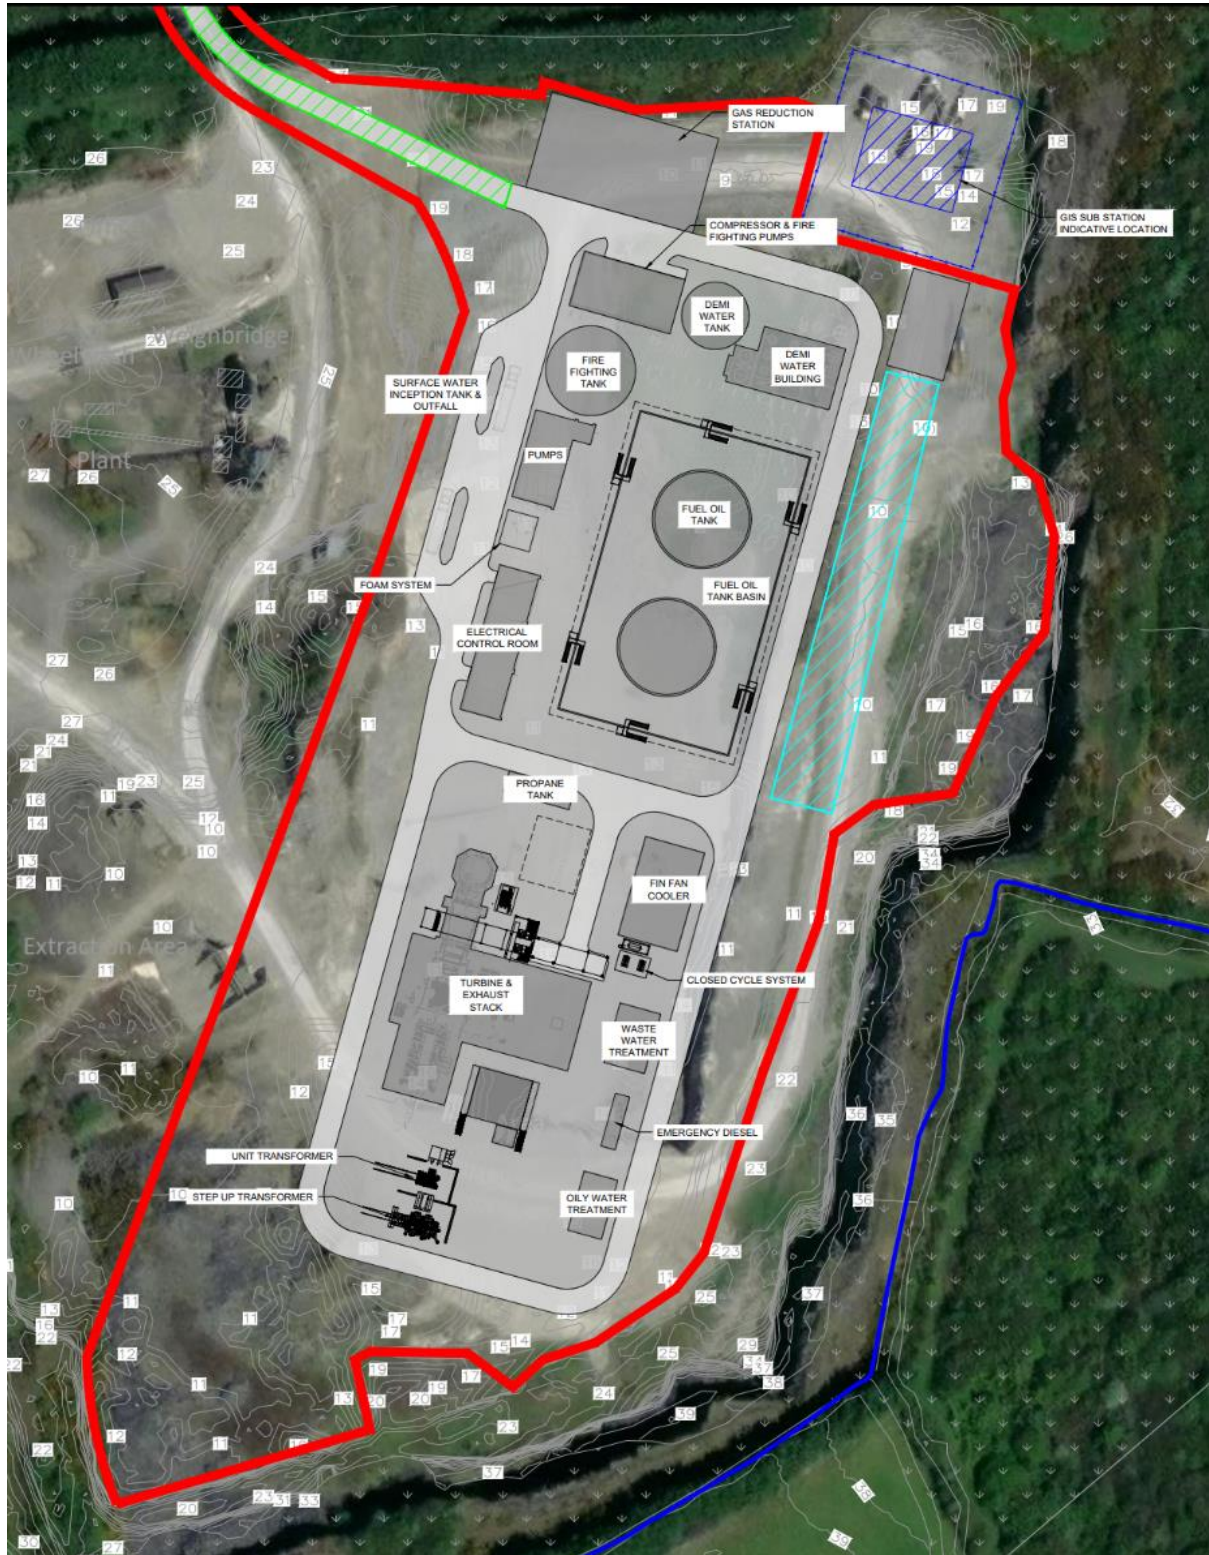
Proposed Site Layout Arrangement. Source: (ROD Drawing No. OCGT-ROD-BAR-XX-SK-CE-0002).
